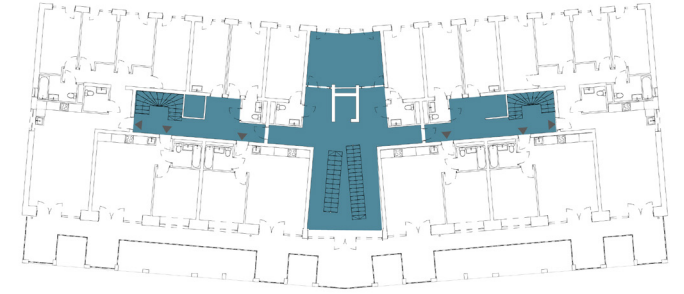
Horizontal Access, Third Floor - Soubeyran / Geneva
